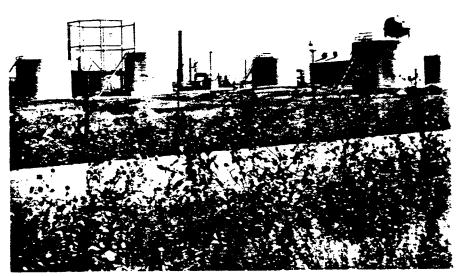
SITE 1-10 SOUTH TANK FARM Looking Northeast at Tanks in East Part of Site
